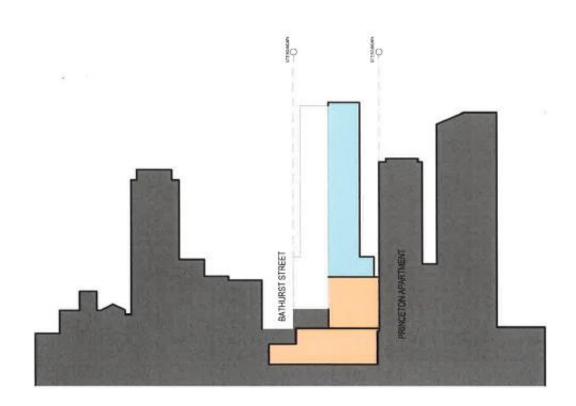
Pitt Street South Concept SSD DA - North South Section (Source: SSD 8876 Concept Stamped Plans)
